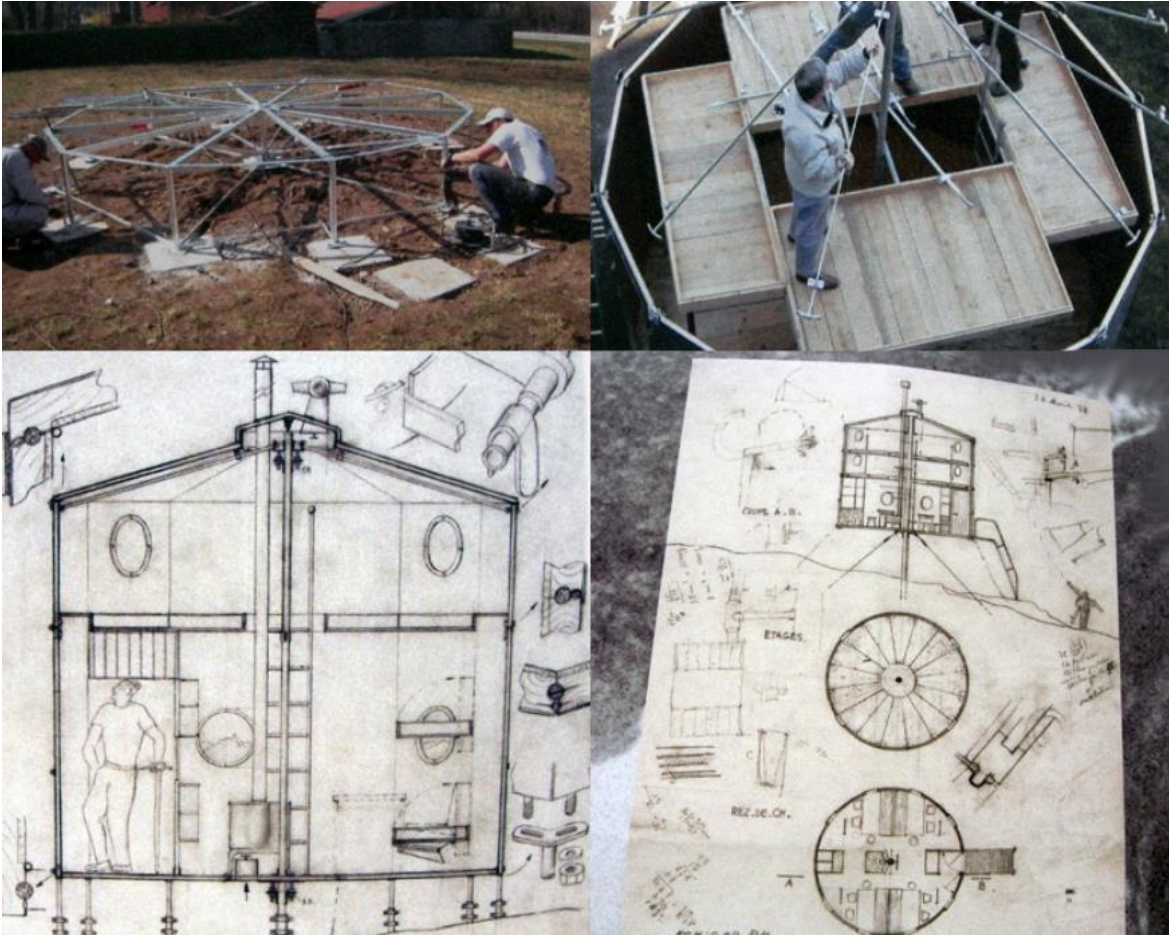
Tonneau Barell Shelter – construction and technical sketches. Source: Perriand Ch., Jeanneret P., 2011
